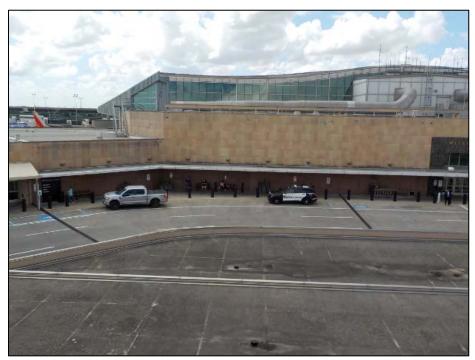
View of the HOU Central Terminal Building at passenger drop off (Level 2), facing south.
